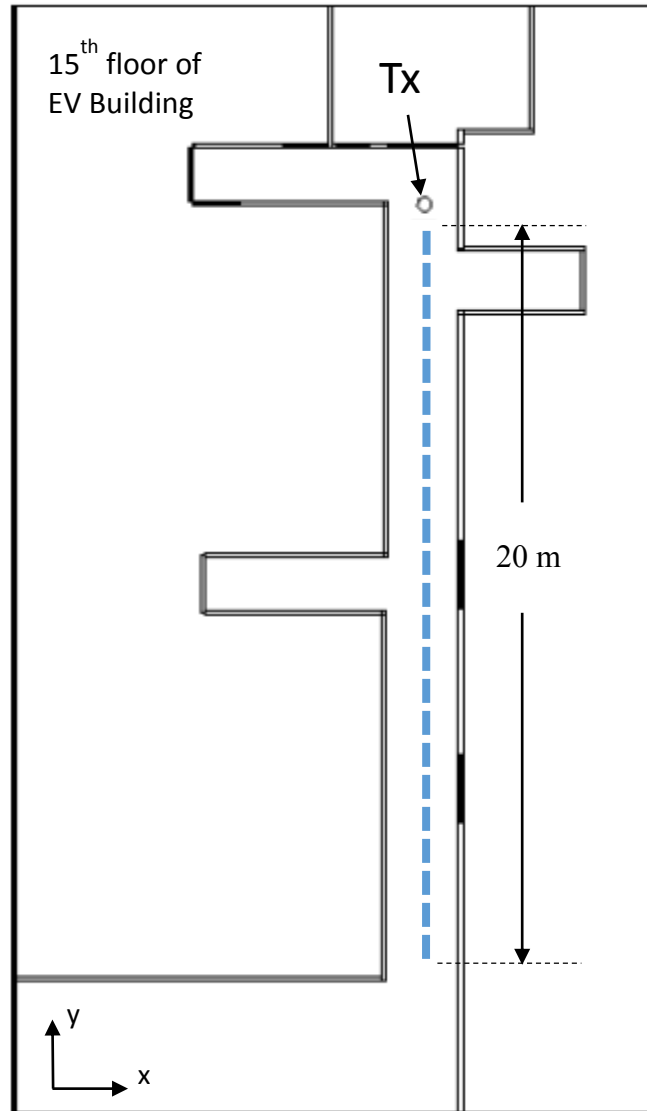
Model of the floor plan of the 15th floor of the EV Building. Line measurement.
